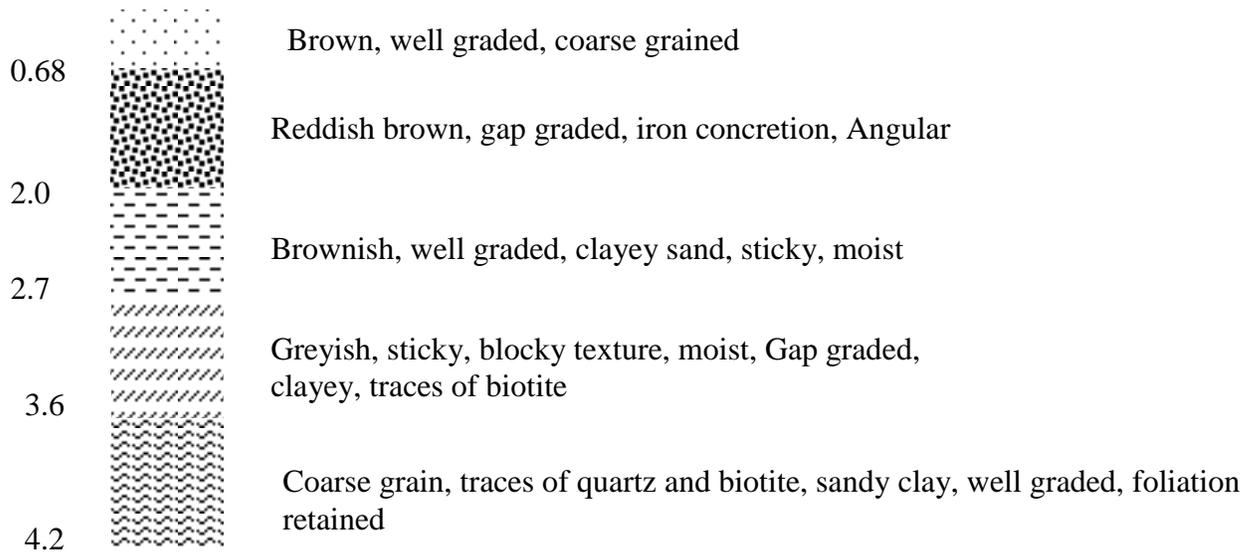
Typical Soil Profile at Eyenkorin Bridge along the road
